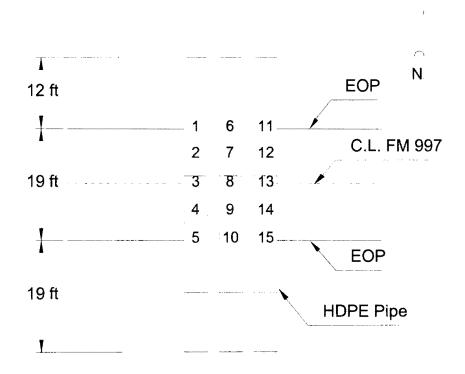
Plan View of Installation A1 in Atlanta District.
